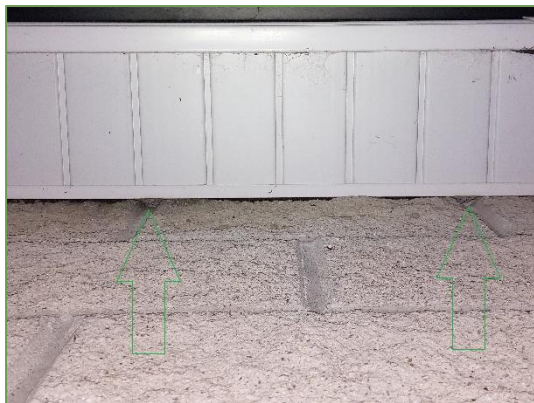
Block work walls with grout lines (green arrows) extending up last soffit, providing crawl space for bat access/egress.
